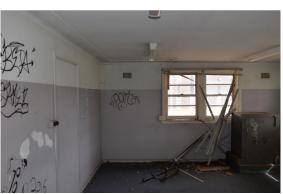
Vandalism and dilapidated window in southern wing of the building.
